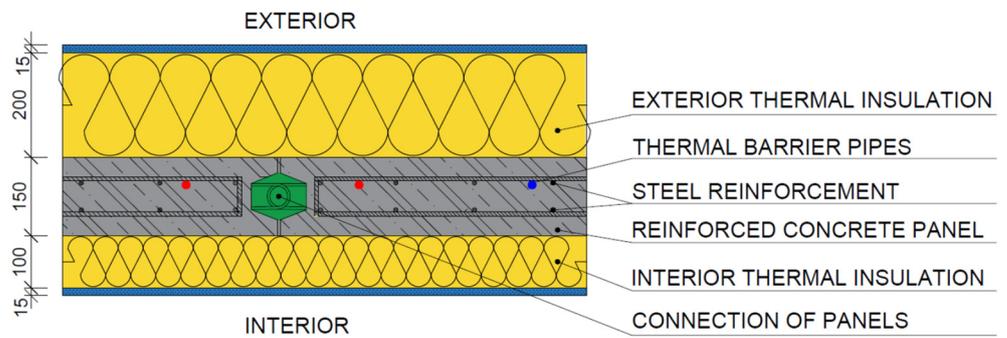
“Detail B”, the through joint of two perimeter panels. The colored points (red and blue) in the picture are thermal barrier pipes.
